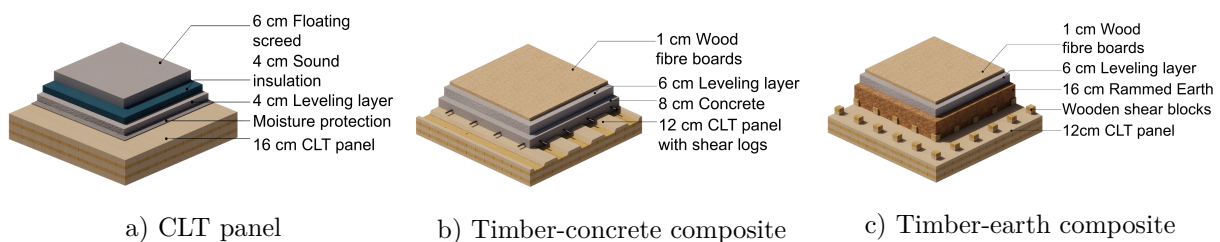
Possible typical floor constructions for a pure timber ceiling, a timber-concrete composite ceiling, and a timber-earth ceiling
